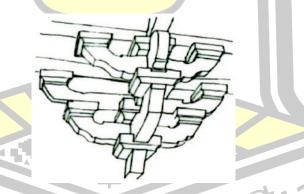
Typical Decorative "Dou Gong" Structure in Mazu Culture Architecture. It is a unique architectural structure in China. Dou Gong, an arch-shaped load-bearing structure, is added in layers from the top of columns, architraves, and purlins or between frames. The square wooden blocks placed between the arches are called "Dou," and together they are referred to as "Dou Gong."
